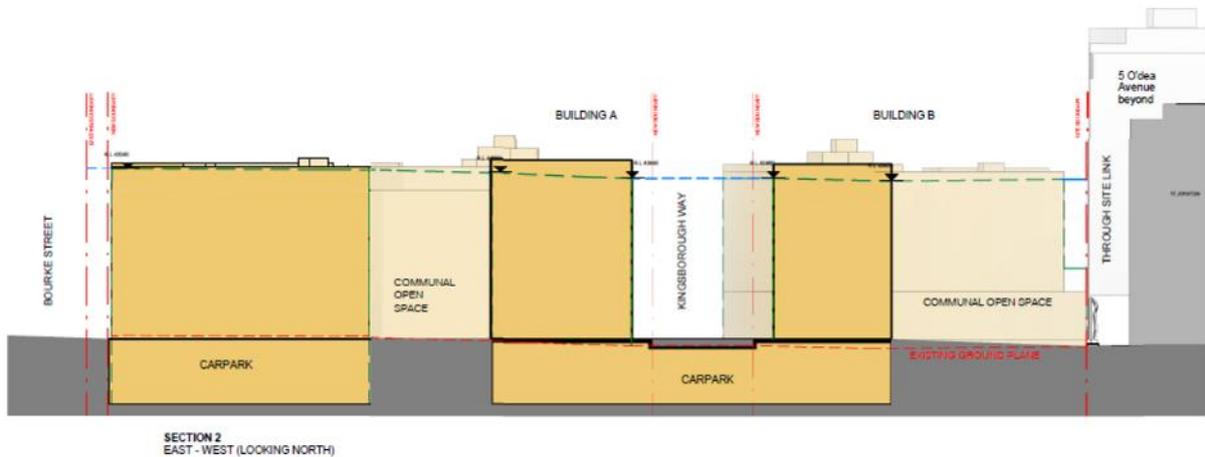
Proposed section for D/2017/1723/A, with the approved envelope outlined in green and 22m height limit outlined in blue
